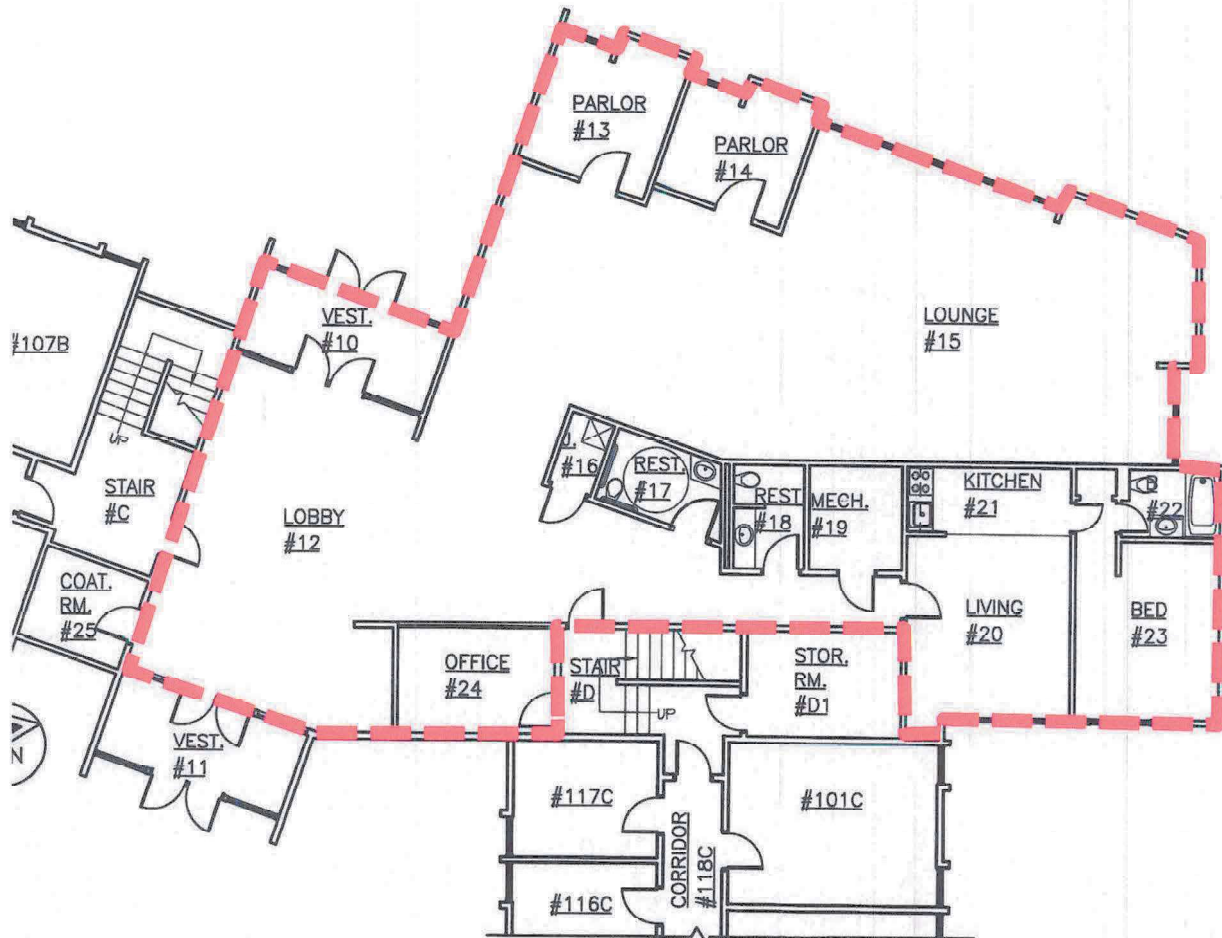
# EXHIBIT A (FLOOR PLAN - LAUNDRY/OFFICE)
